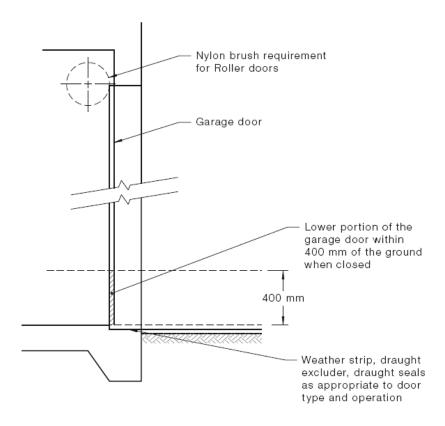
VEHICLE ACCESS DOORS (GARAGE DOORS)
